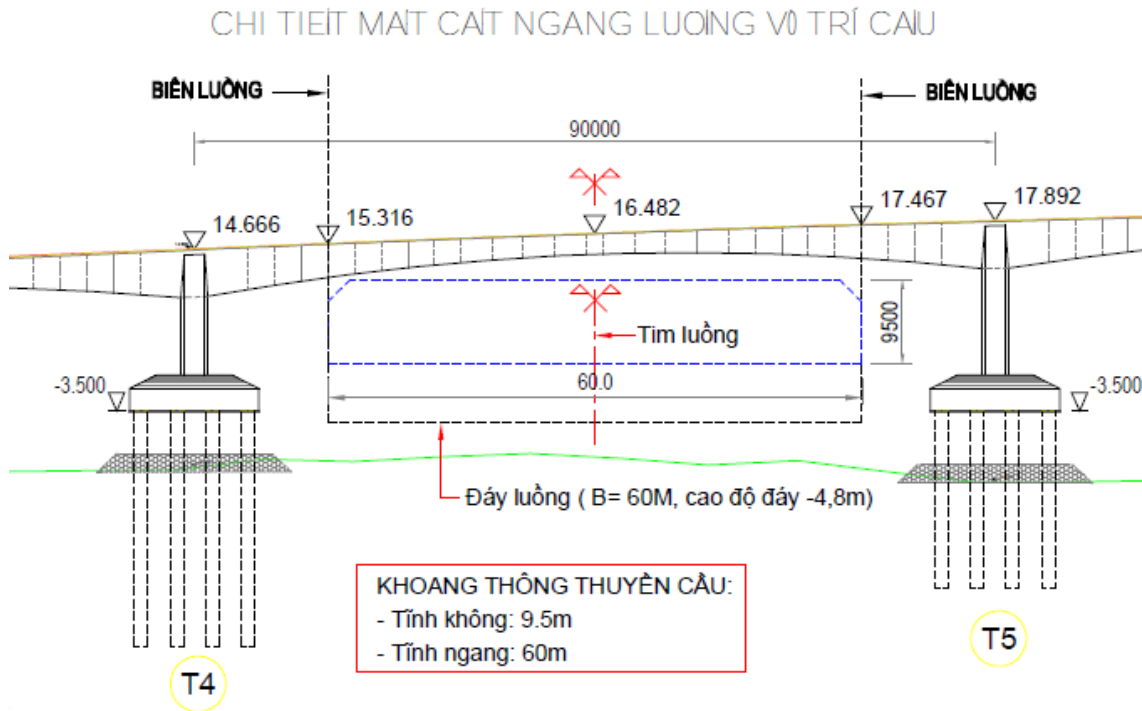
Technical drawing cross section main span Đê Gi bridge (the initial 60 m wide access channel is replaced by a 36 m access channel)
